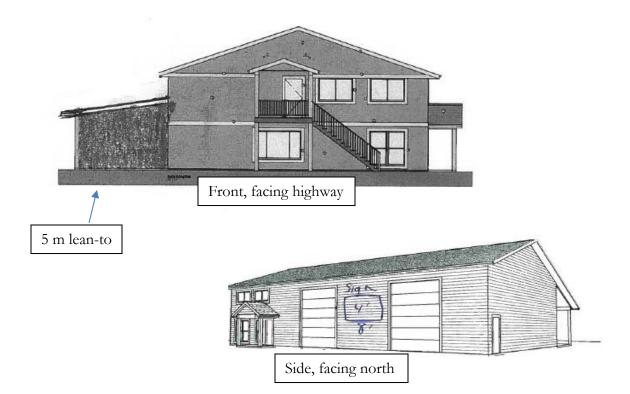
Elevation Drawings provided by Applicant of Proposed Building
